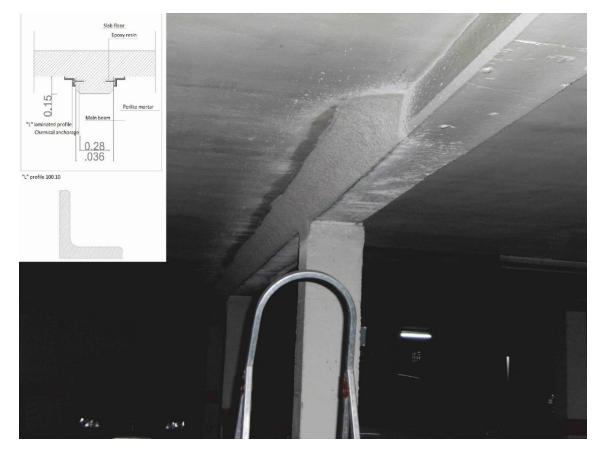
Detail of the steel angle reinforcements between the semi resistant joists and main beams.
